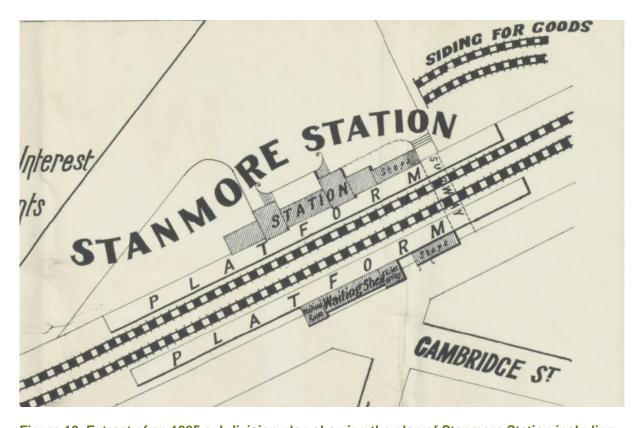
Extract of an 1885 subdivision plan showing the plan of Stanmore Station including the platform buildings (Source: National Library of Australia, 230494439, http://nla.gov.au/nla.obj-230494439)
